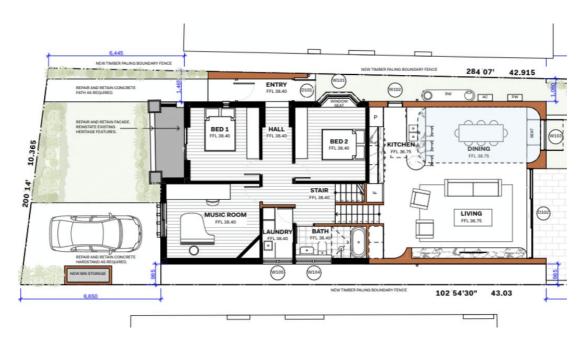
Proposed ground floor plan with hardstand space (Carter Williamson Architects)
